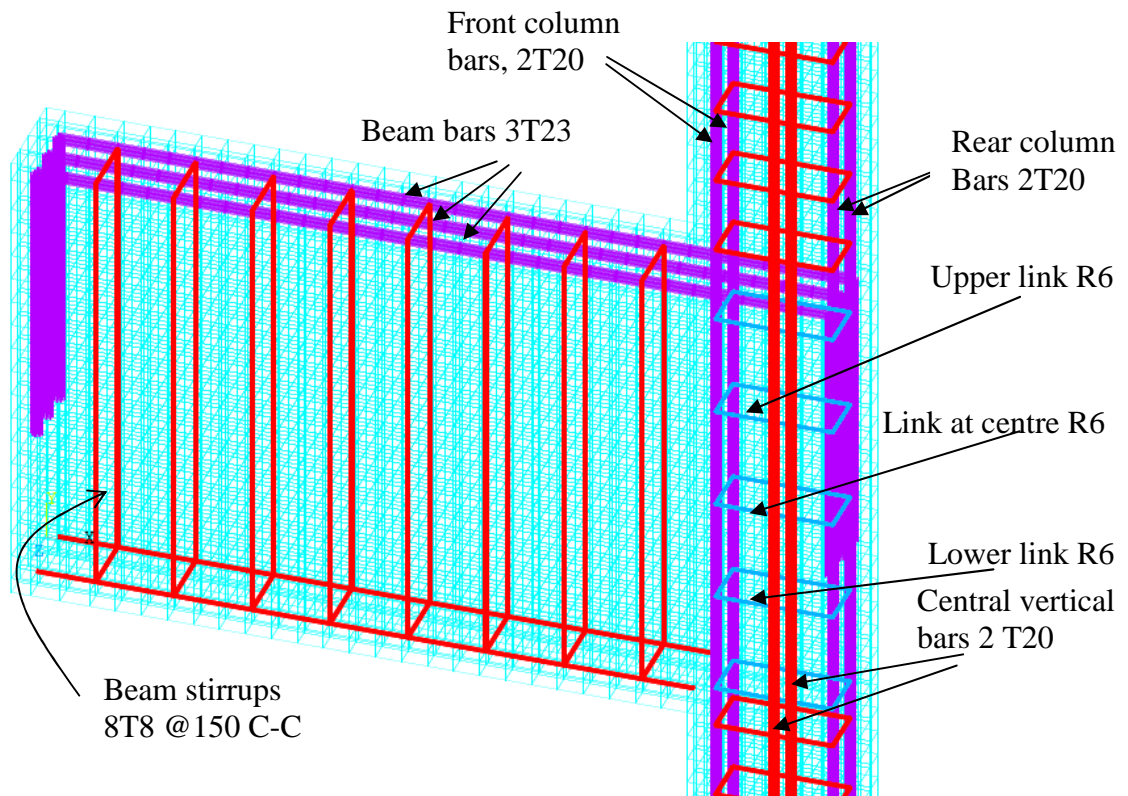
Specimens T-NSC3 and T-HSC3, in addition to the column and beam reinforcement, have 2T-20 placed at half the depth of the column as CVB. The strain in the above identified reinforcement is analysed in detail and graphs are produced for the variation of strain along the shown reinforcement in the following sections.
